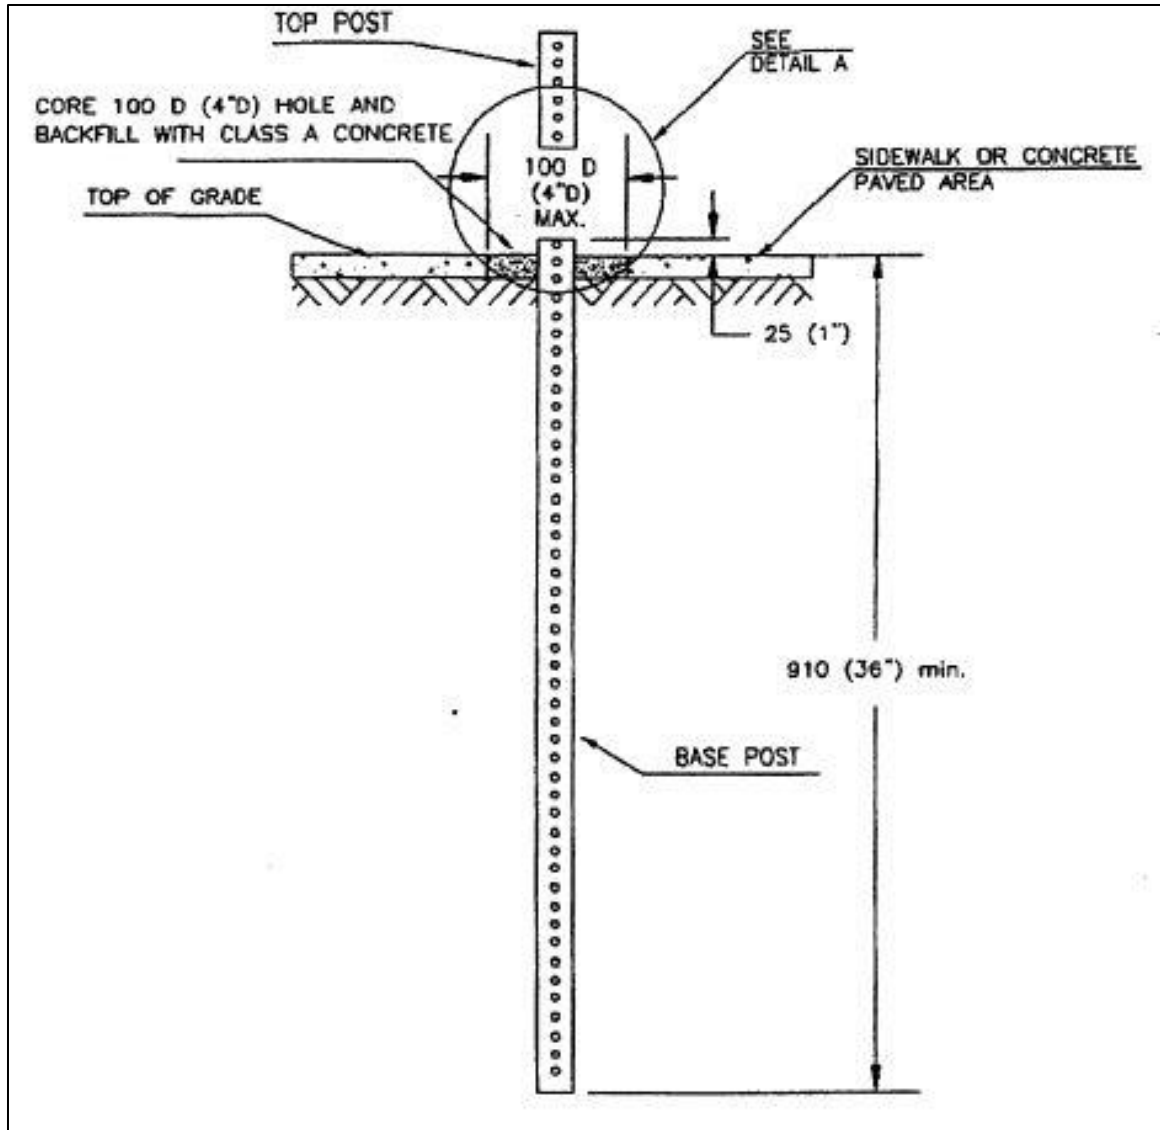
Square tube foundation detail for location with concrete slab (PRHTA, 2010)
